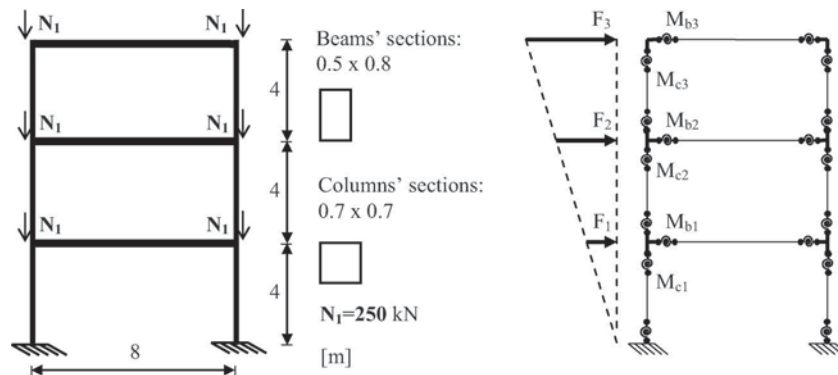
Geometrical data and modelling of the three-storey concrete frame structure.
